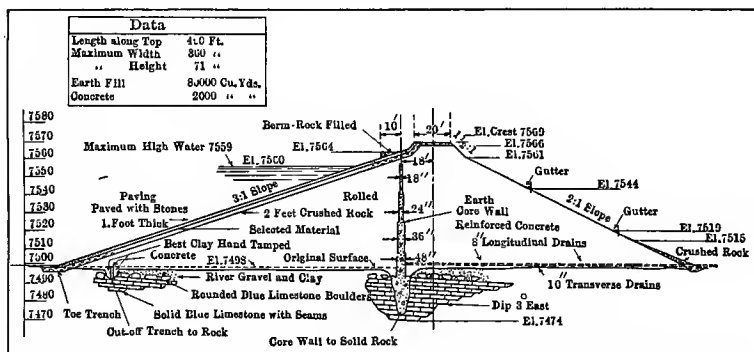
Section of earth dam with concrete core wall and cut-off trenches, Strawberry River, Utah.
